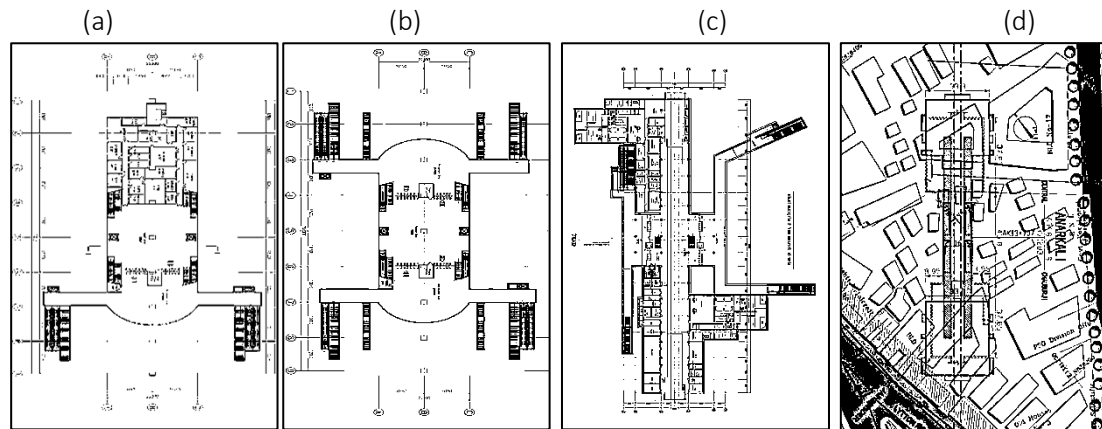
Station Types: (a) Elevated Station, Type A, (b) Elevated Station, Type B, (c) Underground Station, Type C, (d) Underground Station, Type D
